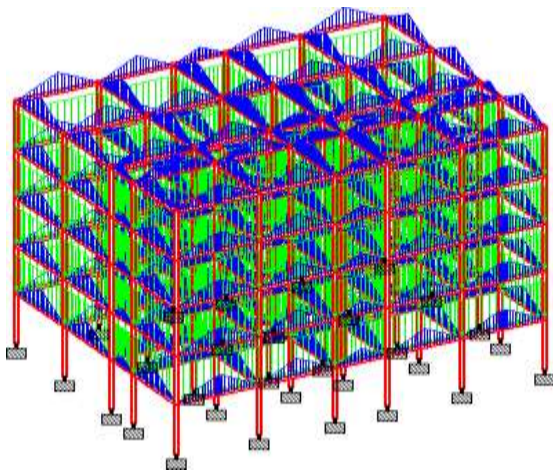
demonstrating the impact of the floor weight on the concrete slabs
